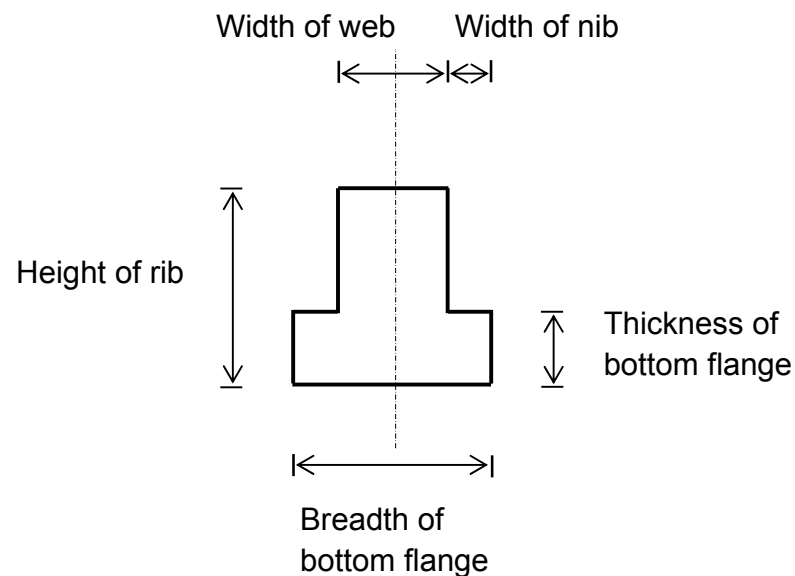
Precast pretensioned inverted T-section rib used in the United Kingdom
